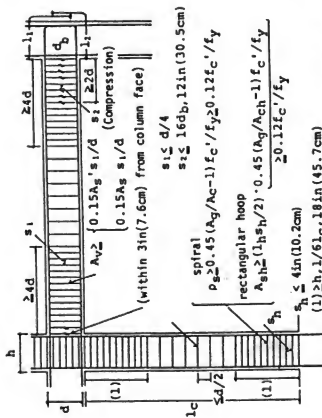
U.S. Requirement for Reinforcement Arrangement (A.C.I. Appendix A5, A6)
